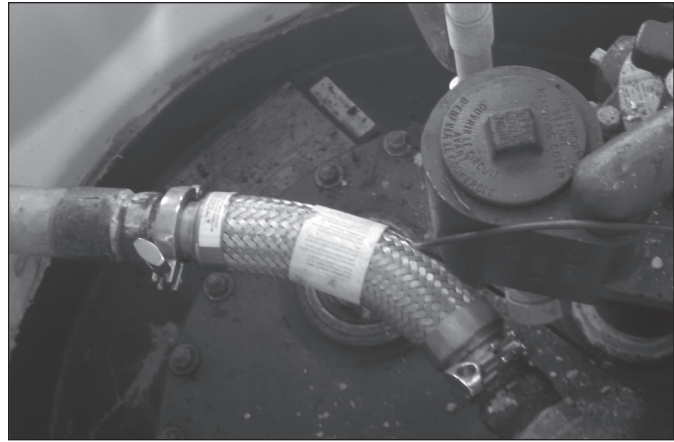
A properly installed flexible connector should bend smoothly without kinks or twists. The bend radius must not exceed manufacturer specifications.
